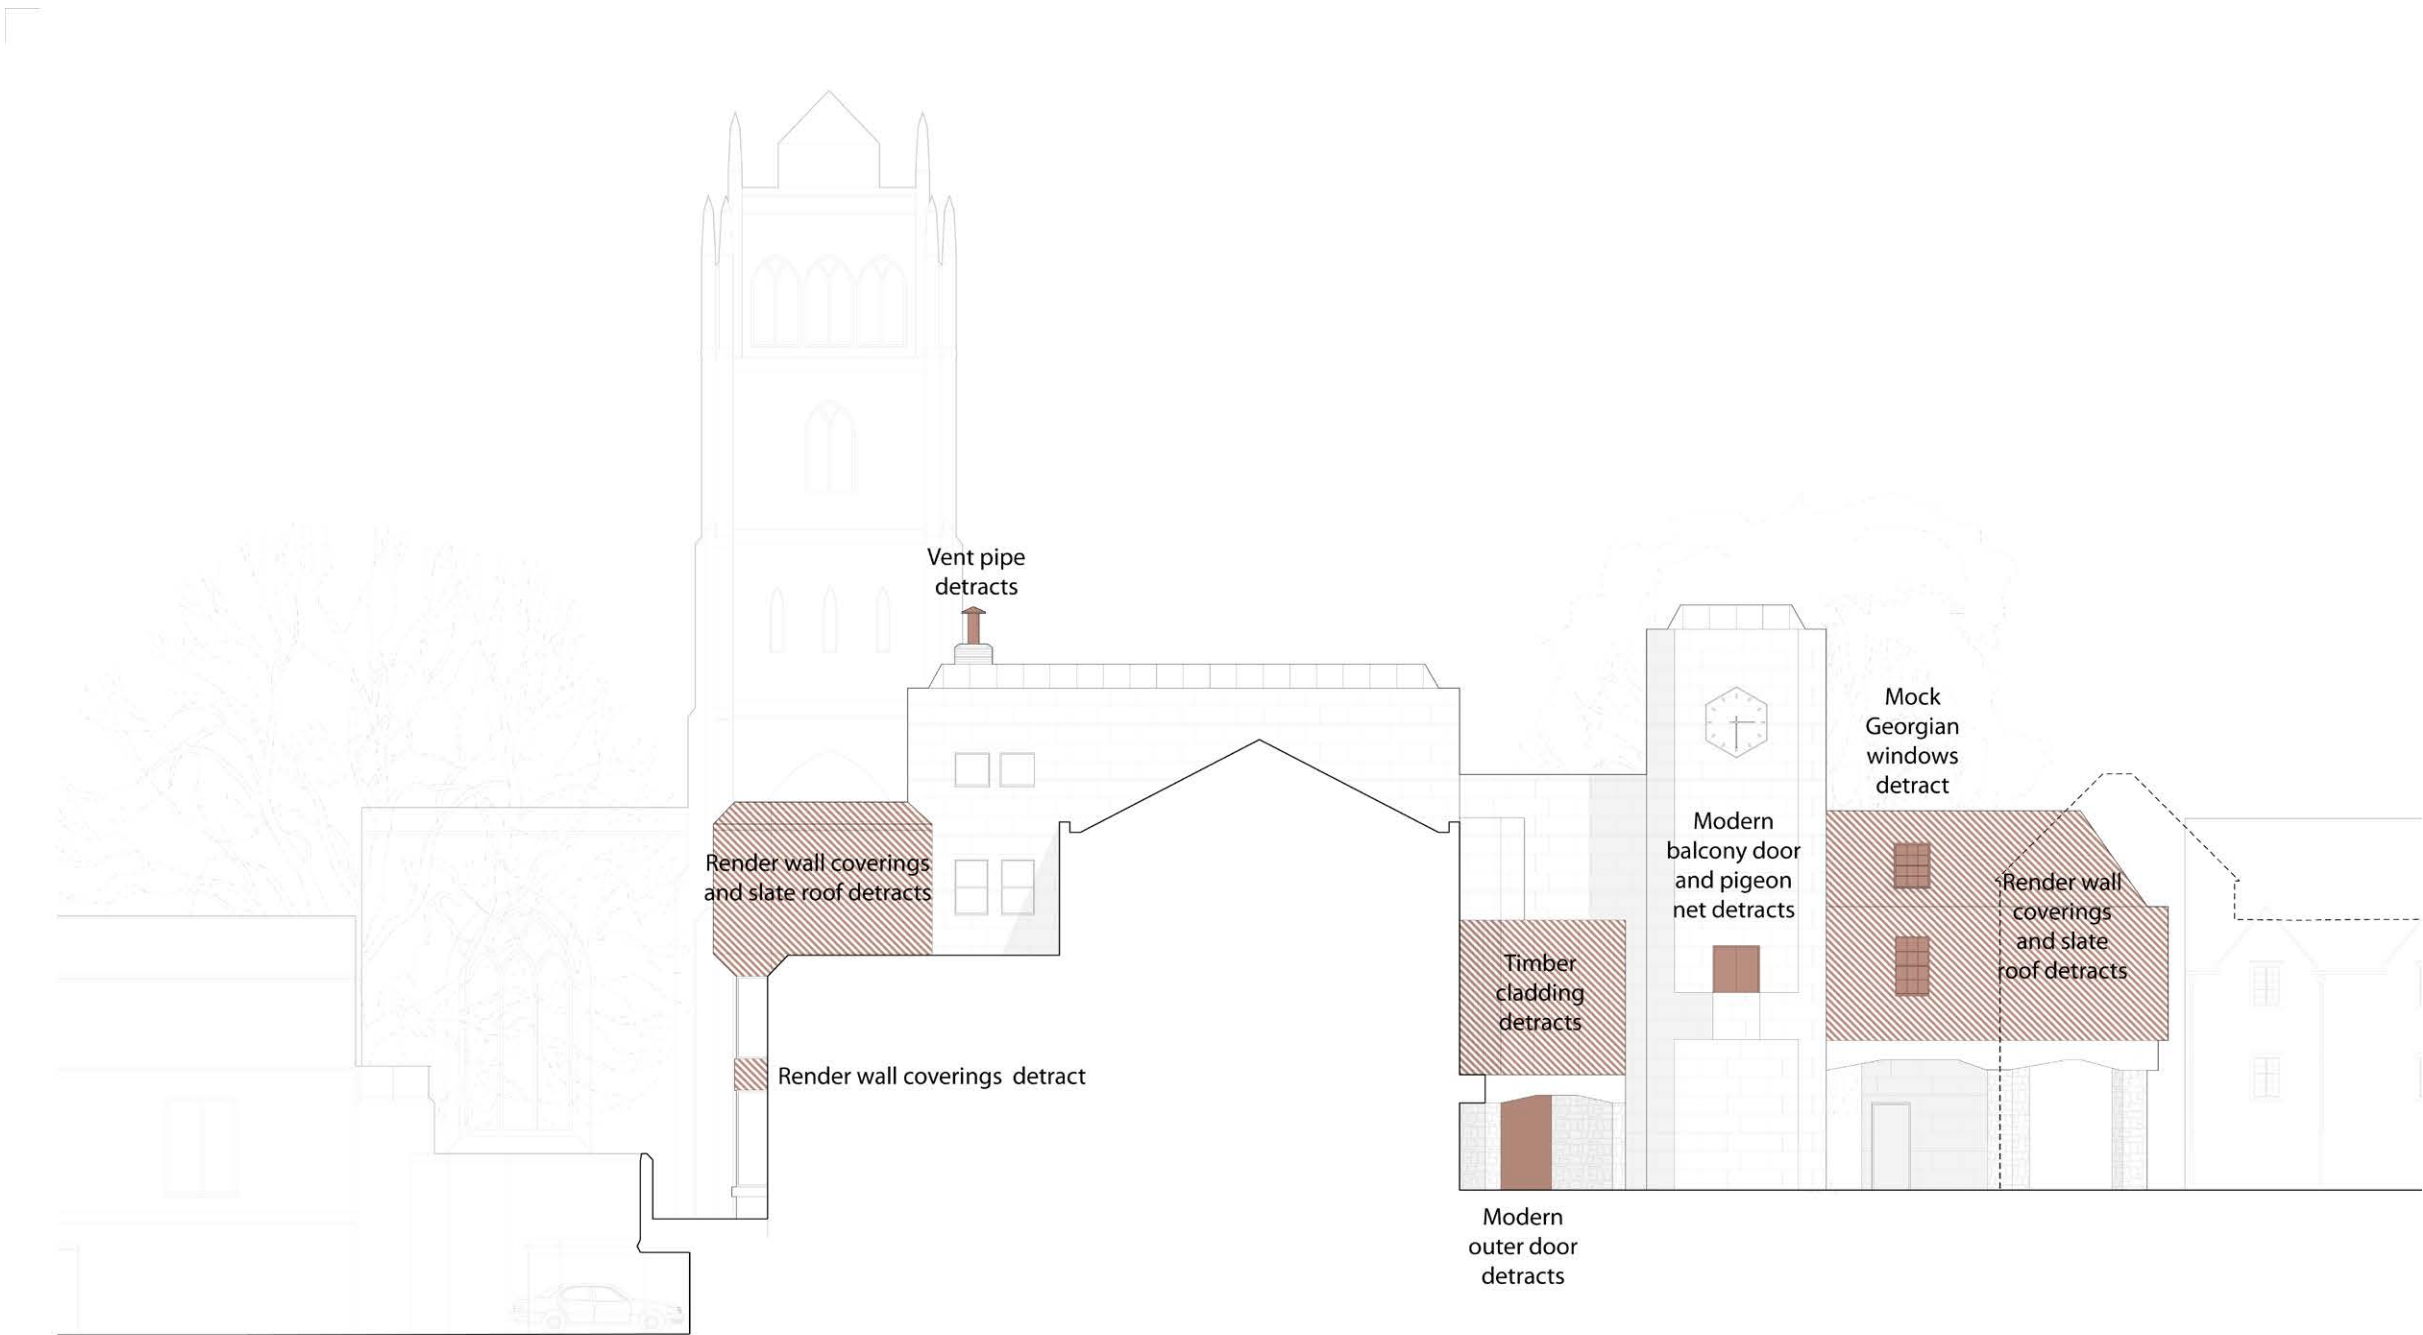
Front (west) elevation detracting fabric [Ian Chalk Architects]
